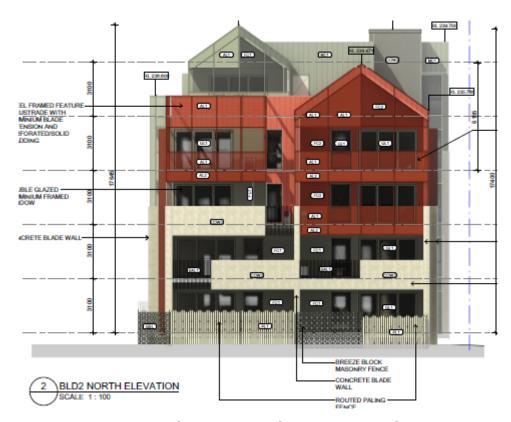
North elevation of Building 2 of the proposed St Andrew's Bendigo Housing Development.
